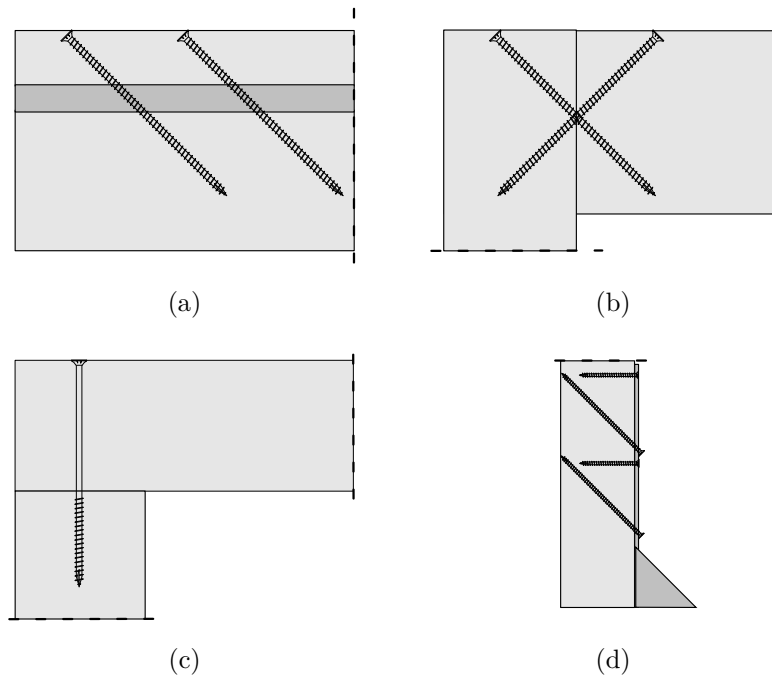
Screw connections (a) composite floor (b) beam to column (c) wall to wall (d) hold-down.
